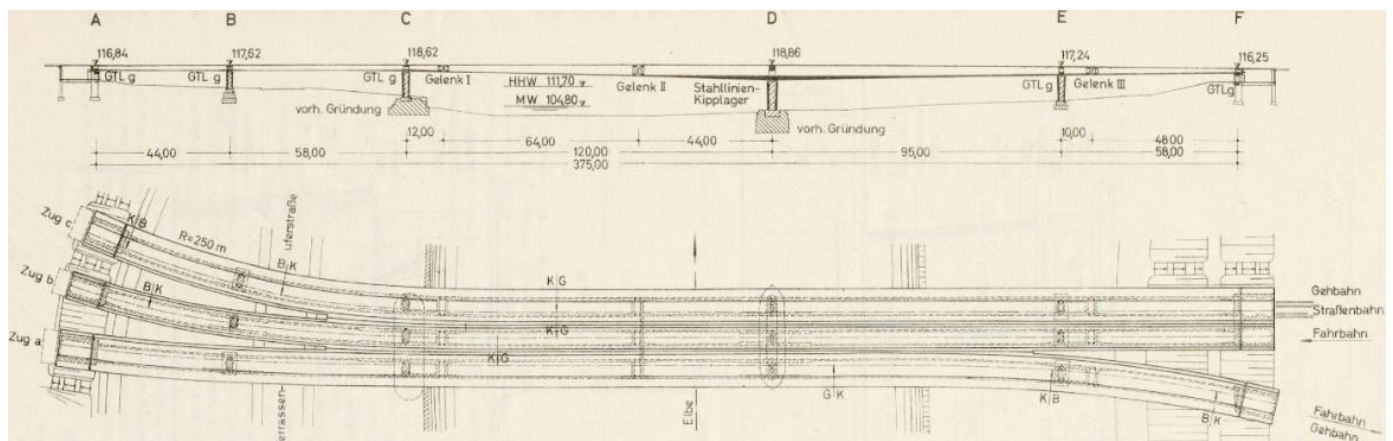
Longitudinal section and ground plan of the Carola Bridge, from [2].
